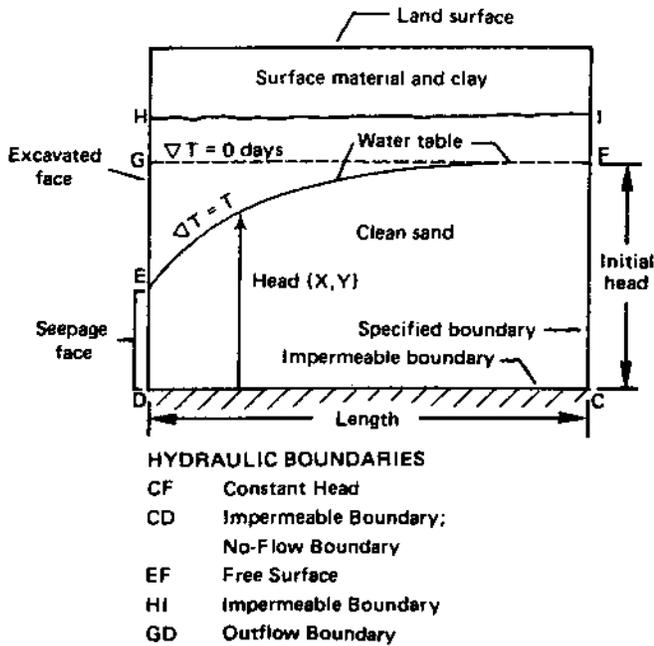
Cross section of pit showing drainage to seepage face.
